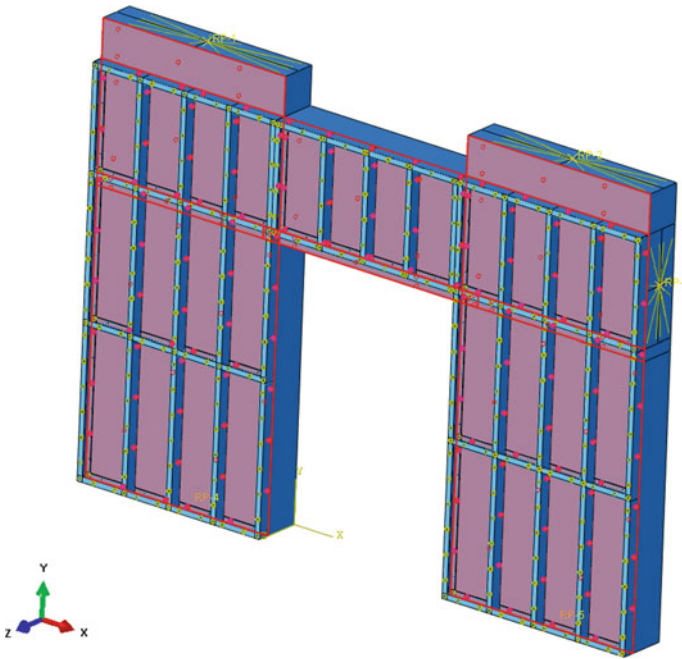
Tie constraint between CFS frame and existing masonry wall
